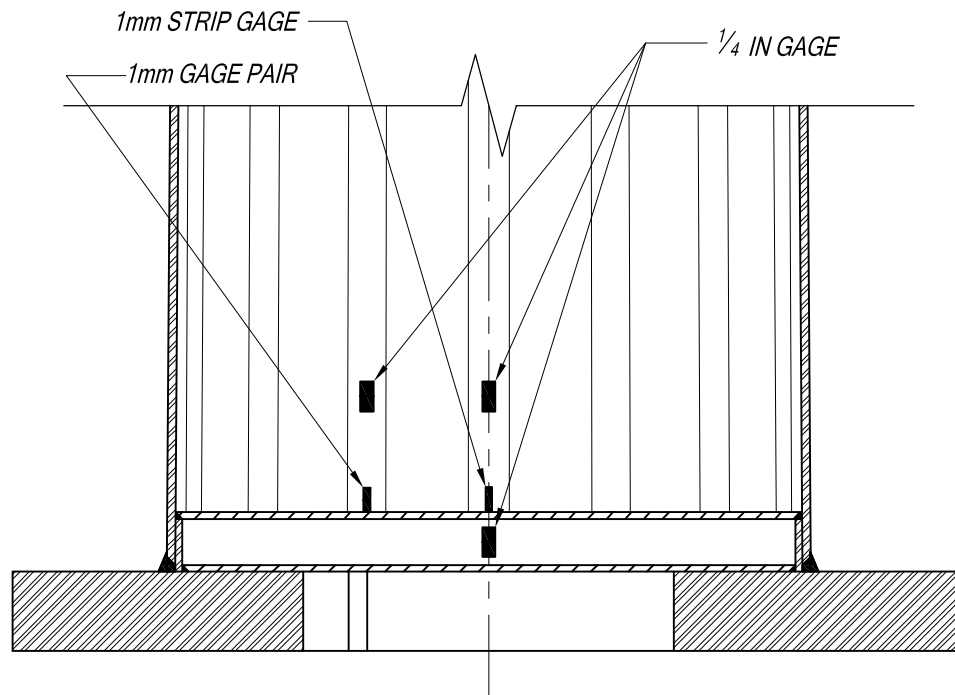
Type XI specimen elaborately instrumented specimen strain gaging plan, tube inside surface
